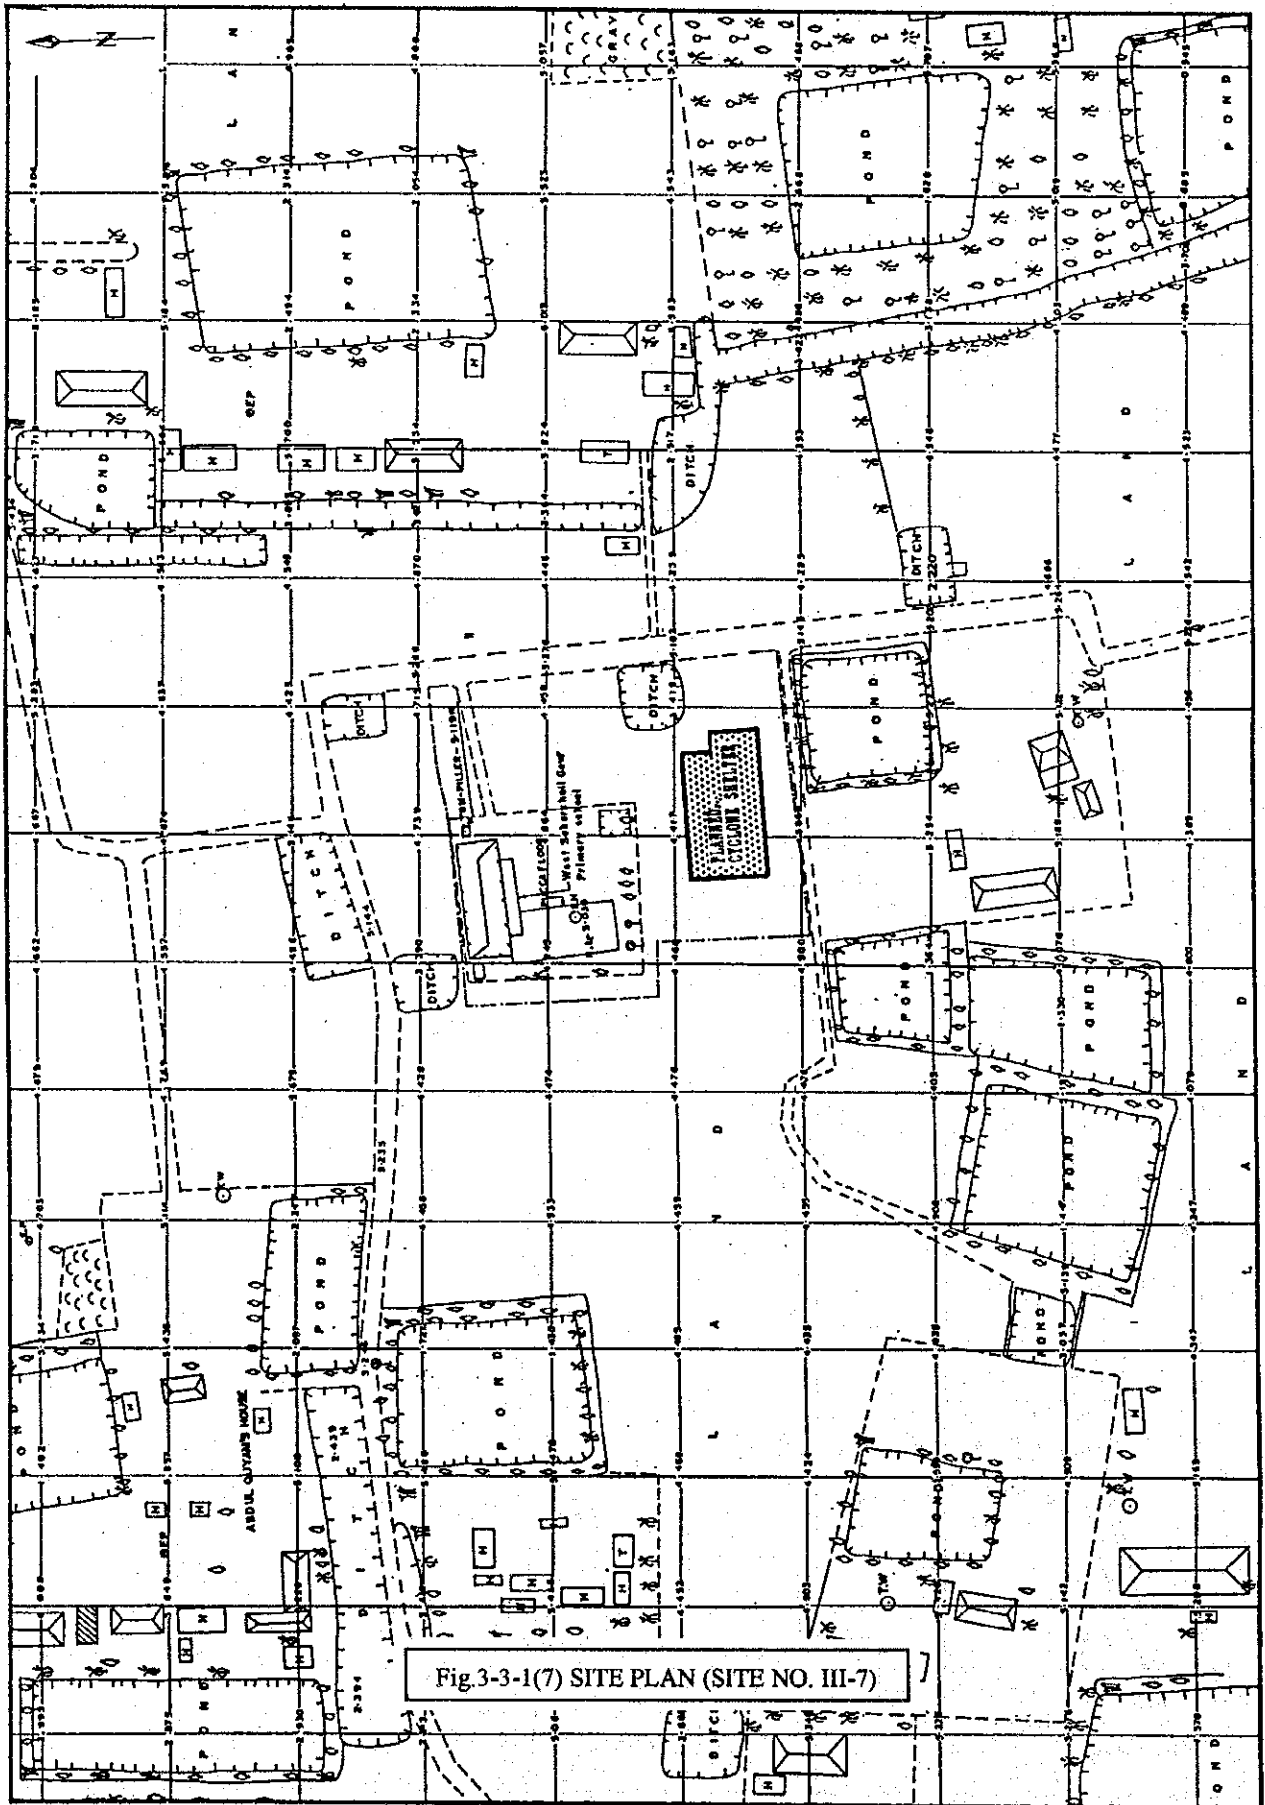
(7) SITE PLAN (SITE NO. III-7)
